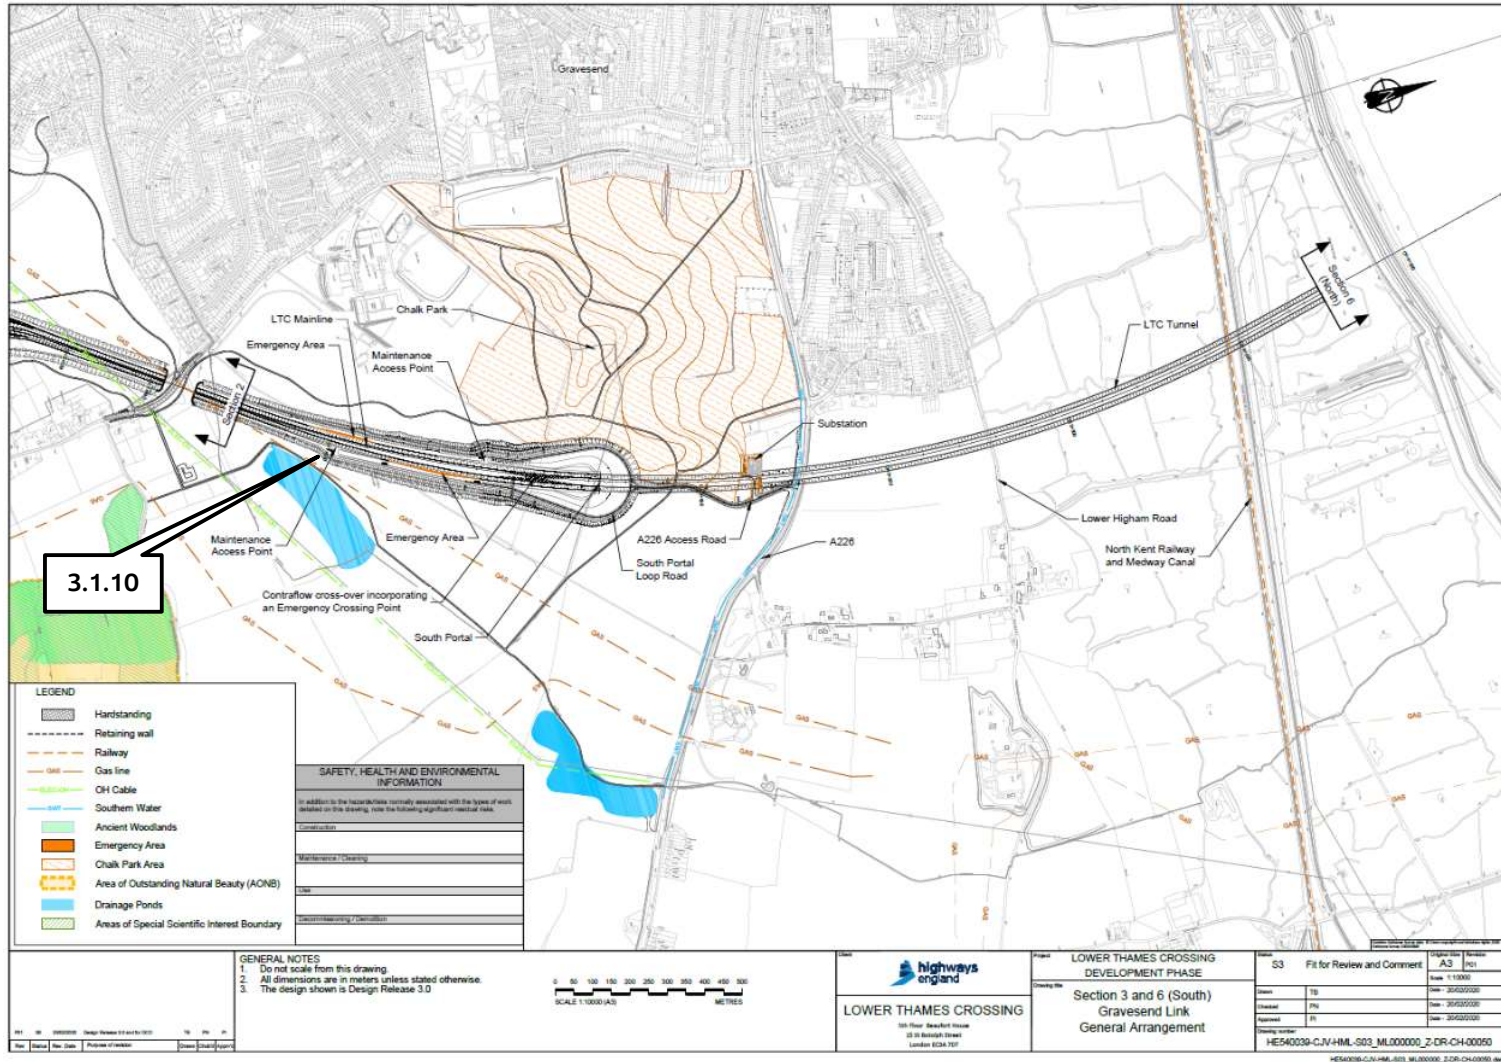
Problem location plan based on GA drawing HE540039-CJV-HML-S02_ML000000_Z-DR-CH-00050
